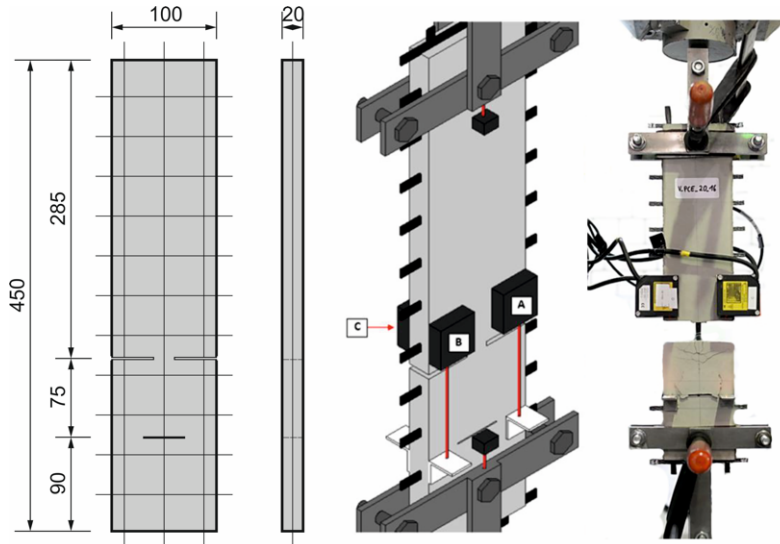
Dimensions of the pull-out specimens (left), laser distance sensors arrangement (middle) and specimen during test (right)
